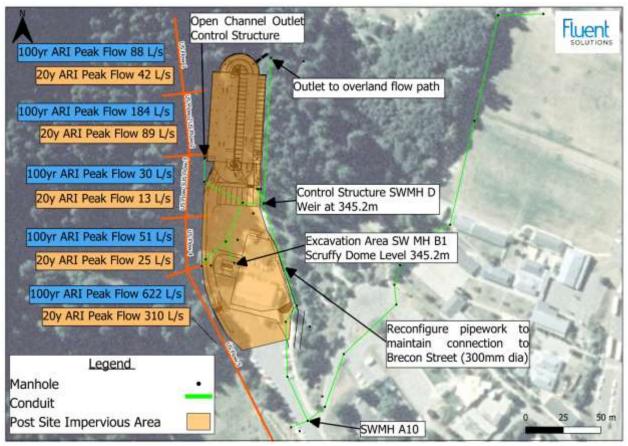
Proposed Revised Stormwater Management Plan Layout
